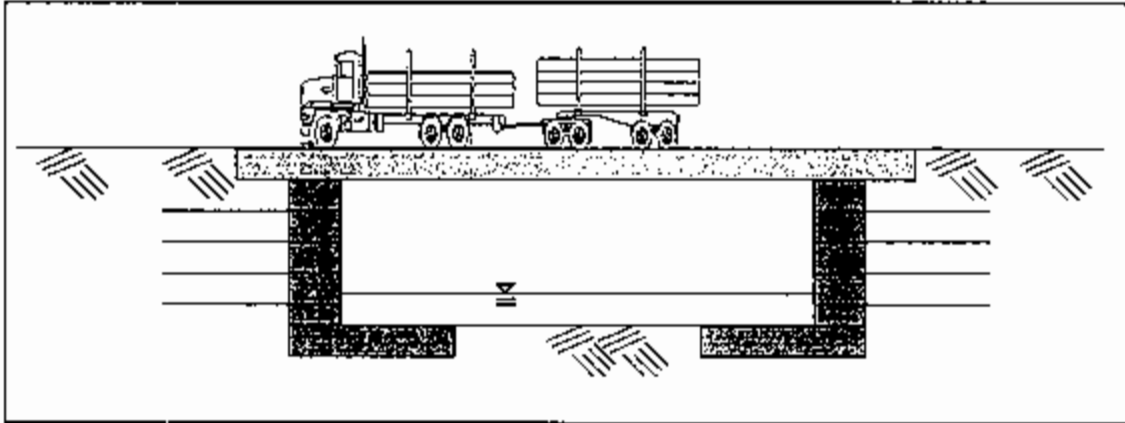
Gabion mattresses, baskets and geogrid used for bridge abutments
